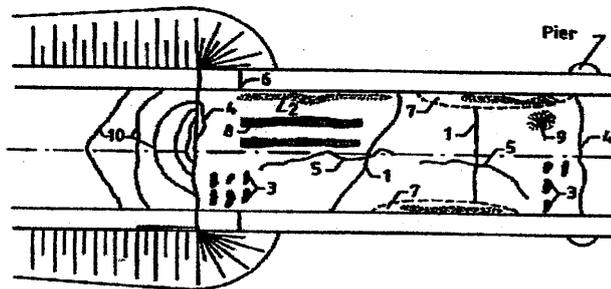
Damage in paved roadway on concrete/composite bridges
